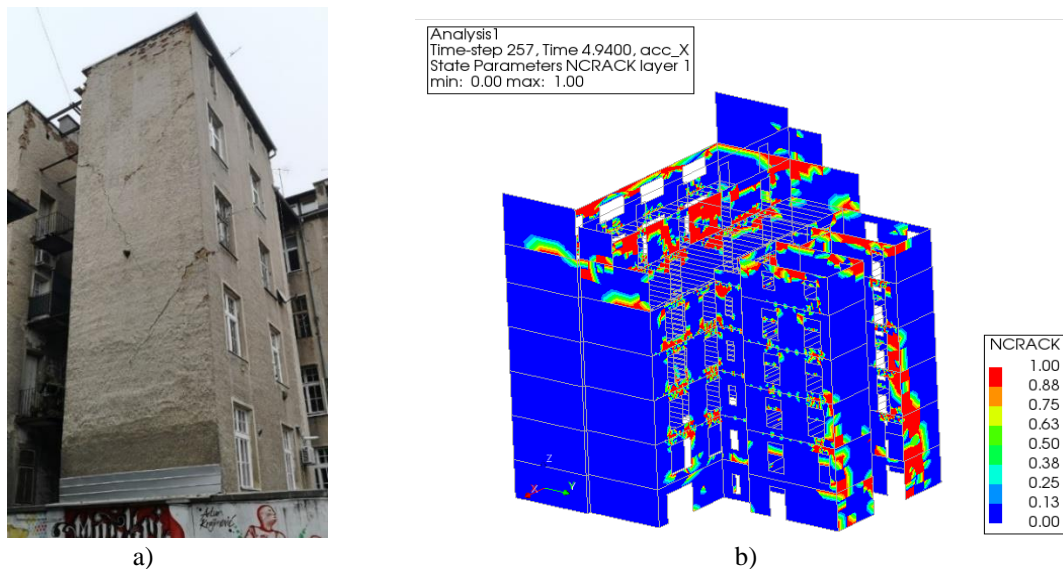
Degradation of the building: a) Actual state after Zagreb earthquake; b) Cracking pattern.
